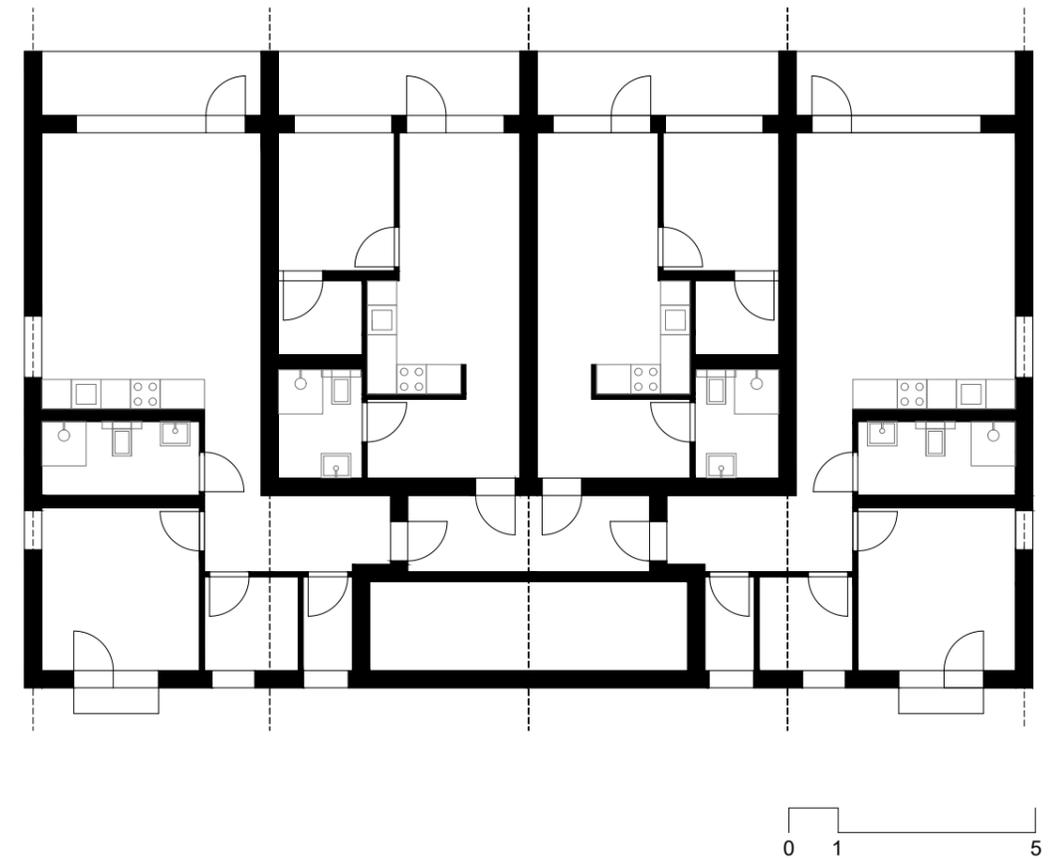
Kajstaden Tall Timber Building's typical floor plan
